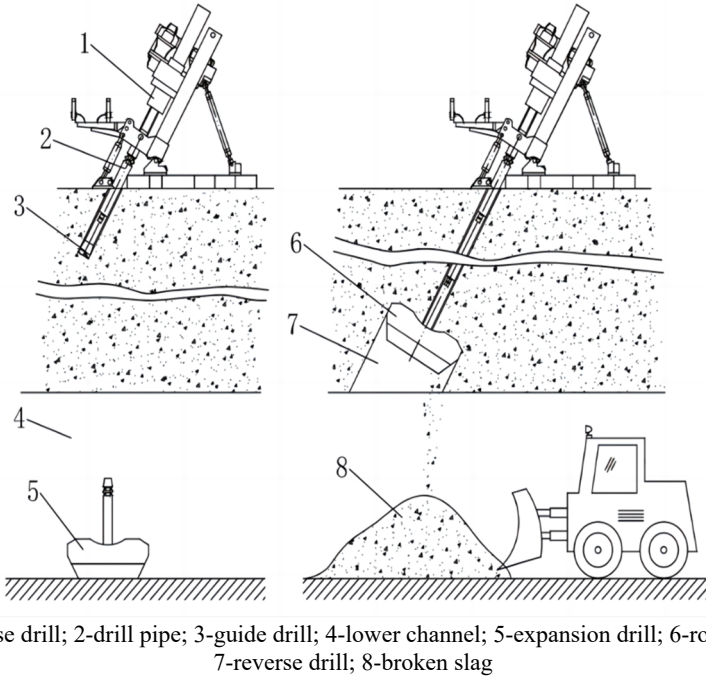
Schematic diagram of drilling process: (left) Guide hole drilling, (right) expanded hole drilling
